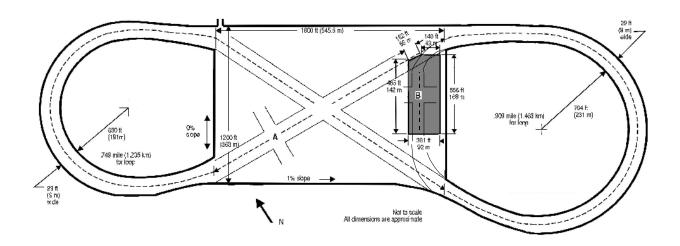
Illustration of location and layout of test courses used in the dry and wet pavement testing [14].
